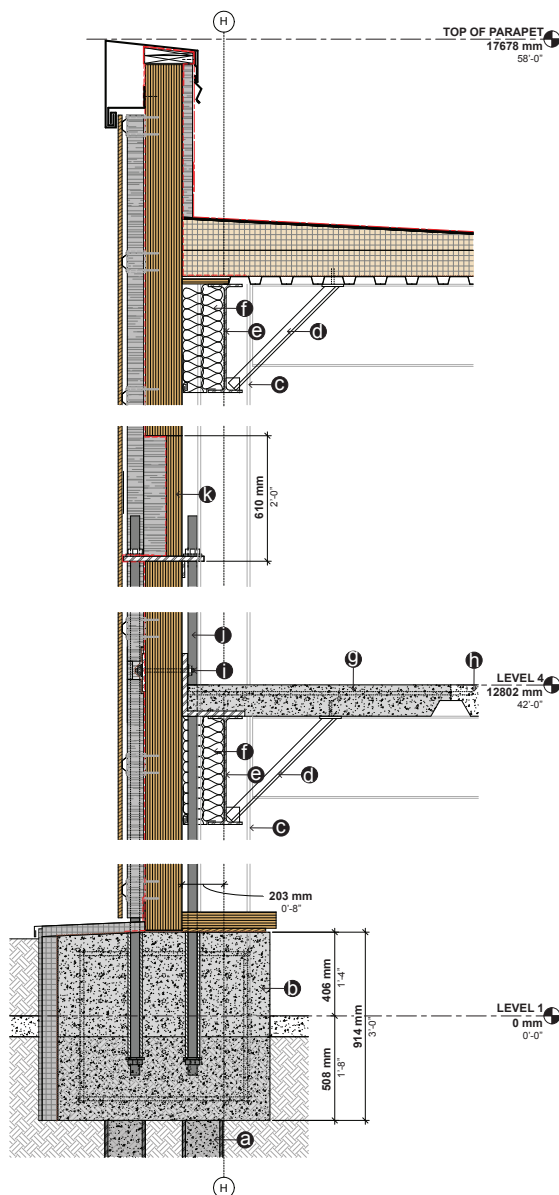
Façade rocking wall panel foundation and slab connection details: a. new steel micropile, b. new concrete pier cap, c. existing steel column, d. new steel strut, e. existing perimeter beam, f. firestopping and trim, g. new reinforced slab upgrade, h. existing slab, i. MTP connection, j. post-tensioned steel rod, k. 78 mm MTP plug
